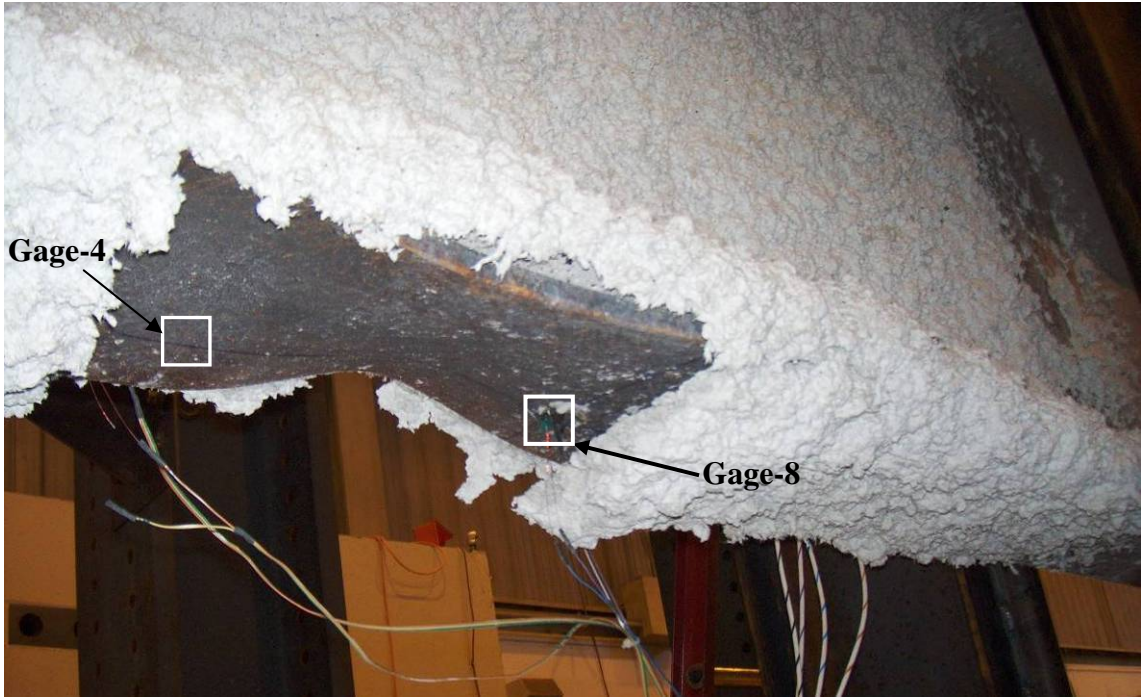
DM assemblage showing buckling in the bottom flange at completion of testing
